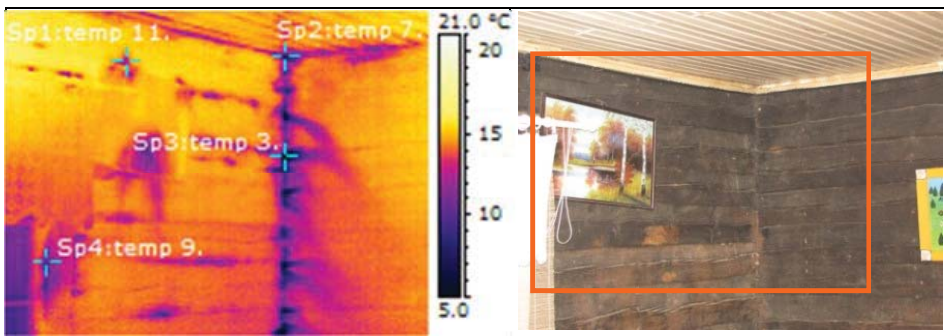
Air leakage in the junction of external walls and through cracks between logs, thermocam image (left) and photo (right).
